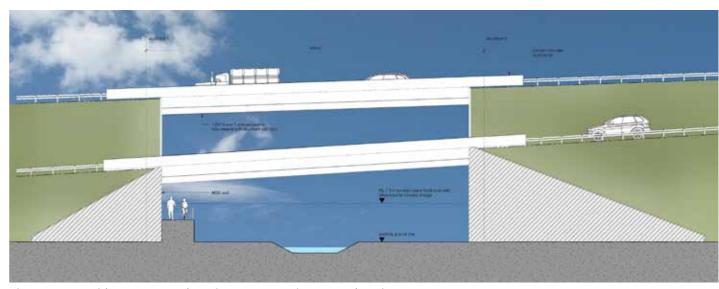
Bridge 15: Pauatahanui Stream Crossing west elevation
